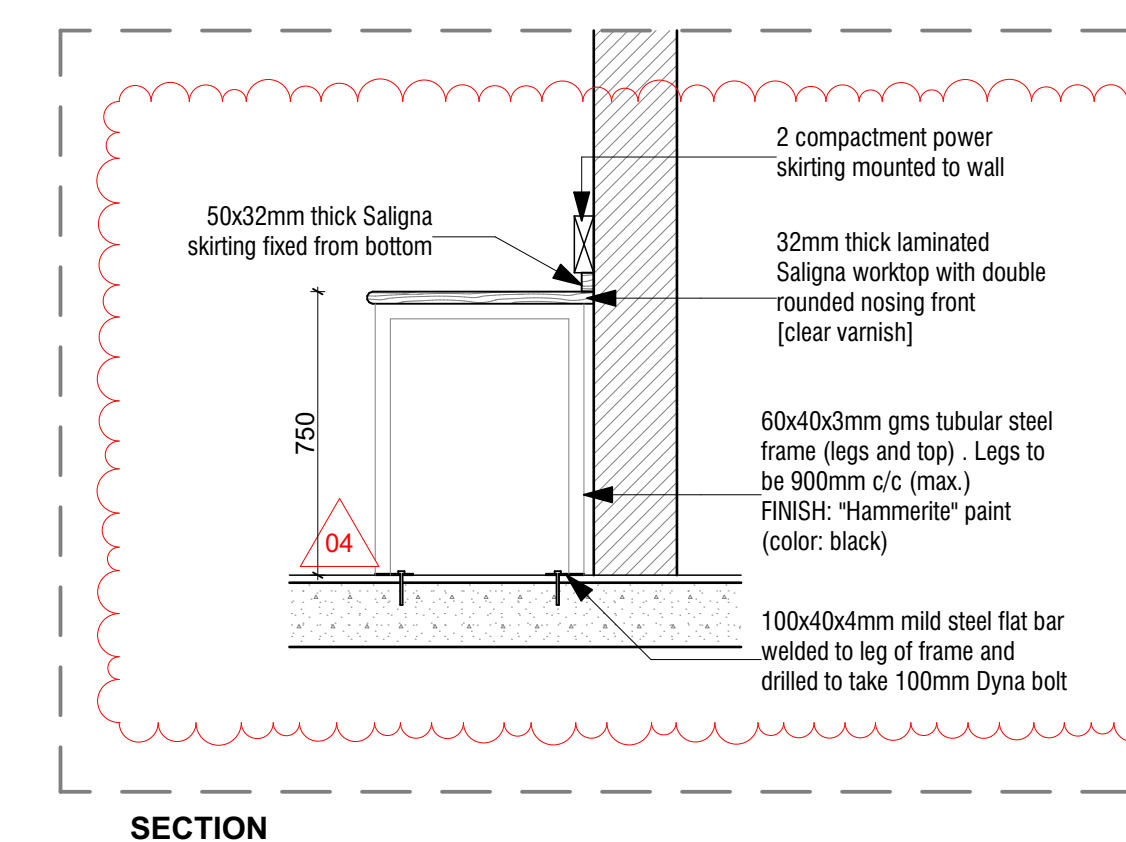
DETAIL No. NEWSPAPER STAND	SCALE 1:20	DETAIL DESCRIPTION NEWSPAPER STAND: SECTION	LOCATION MEDIA CENTRE
